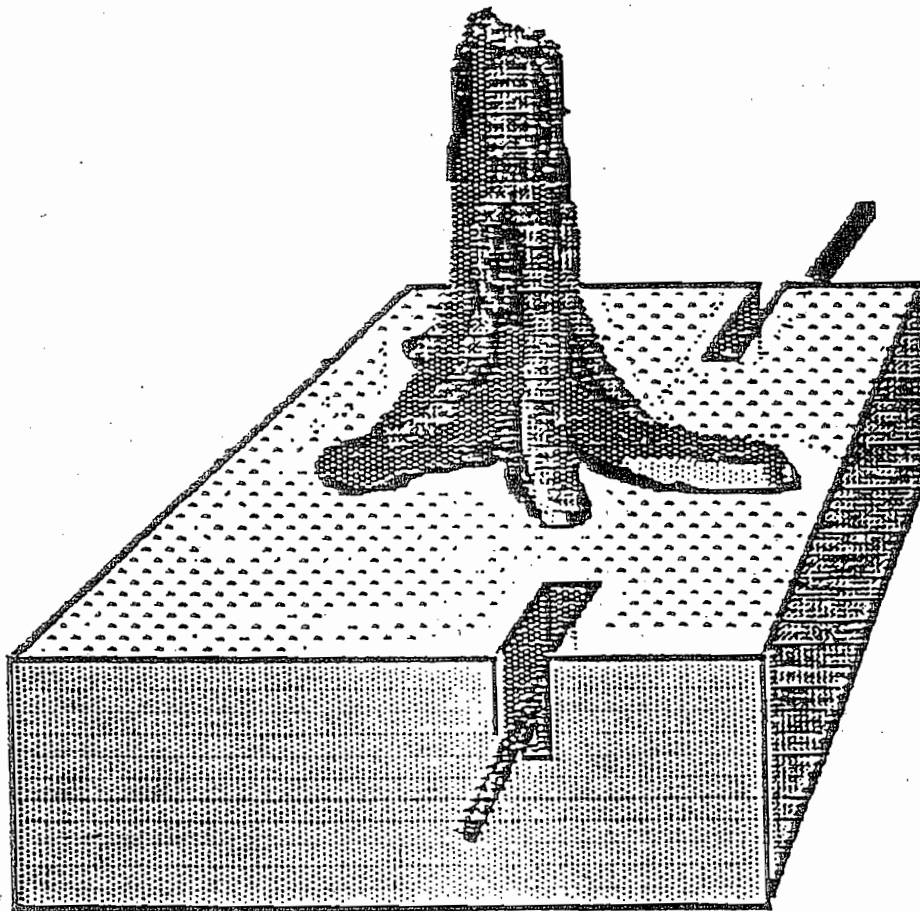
TUNNELING FOR UNDERGROUND UTILITIES
